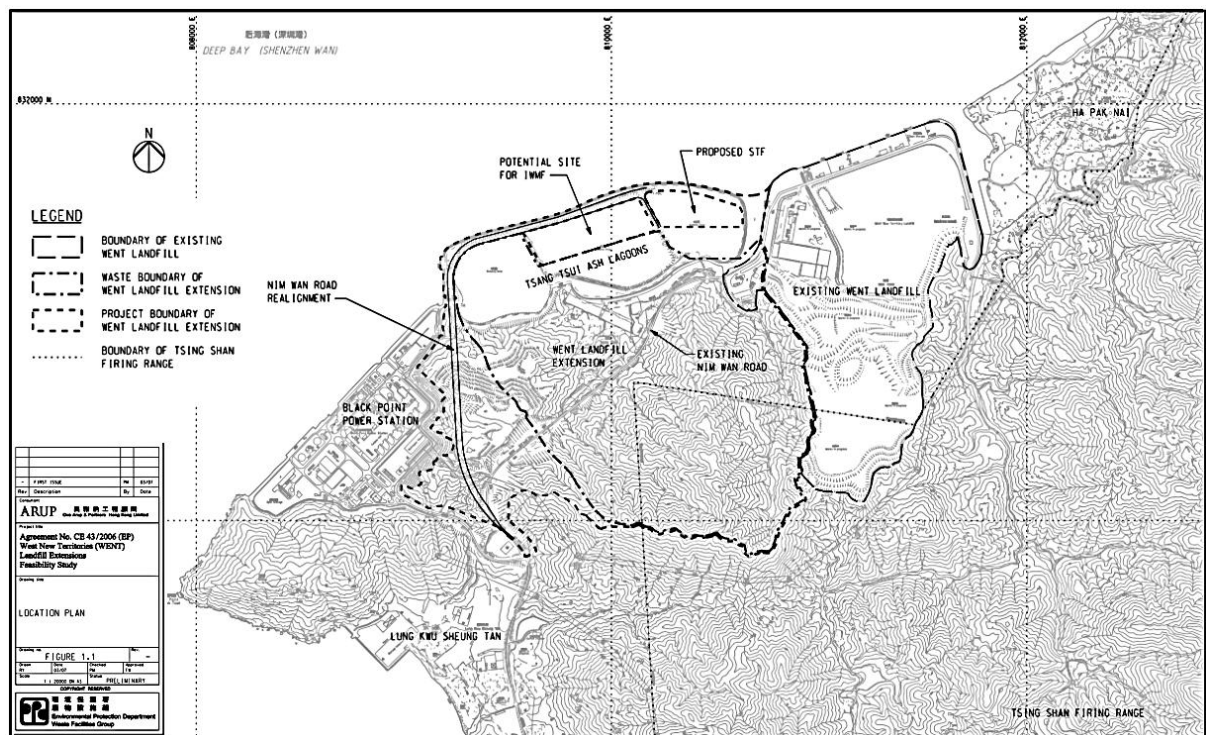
Location Plan of the WENT Landfill Extension (WENTX) Site
